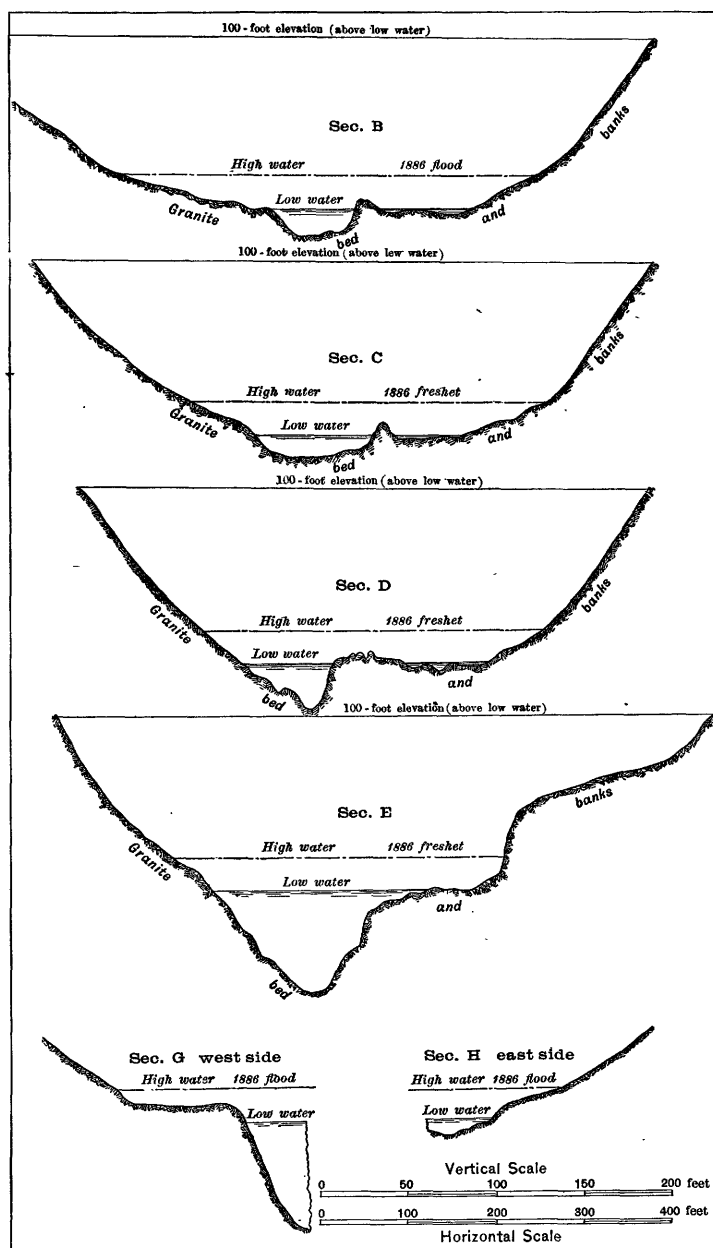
Cross section of Tallapoosa River at Cherokee dam site.
